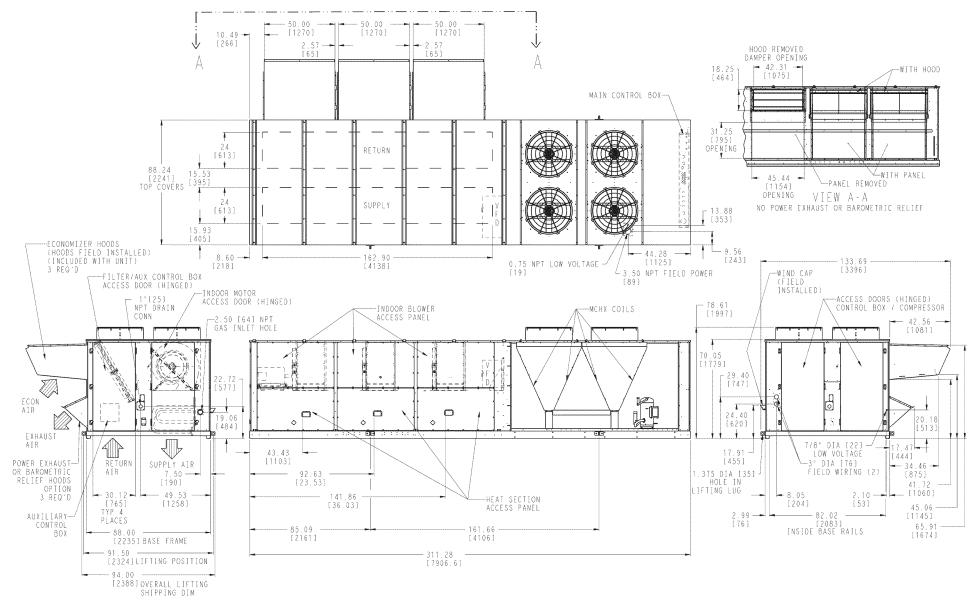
Base Unit Dimensions — 48A2,A3040-050
